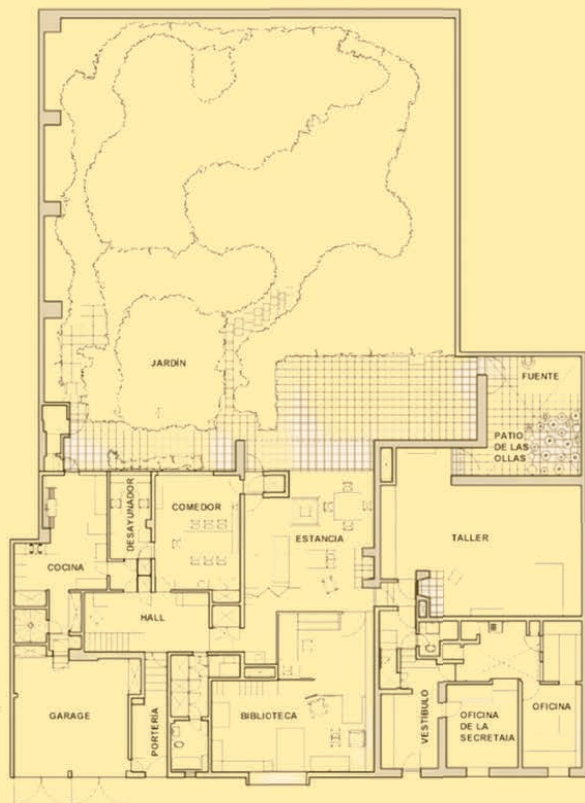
Barragán. n.d. Casa Luis Barragán Ground Floorplan
